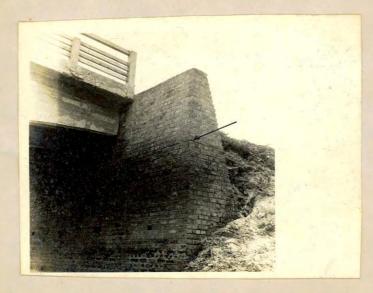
Failure due to non-functioning of the expansion bearings (Horizontal cracks in the masonry abutment)
